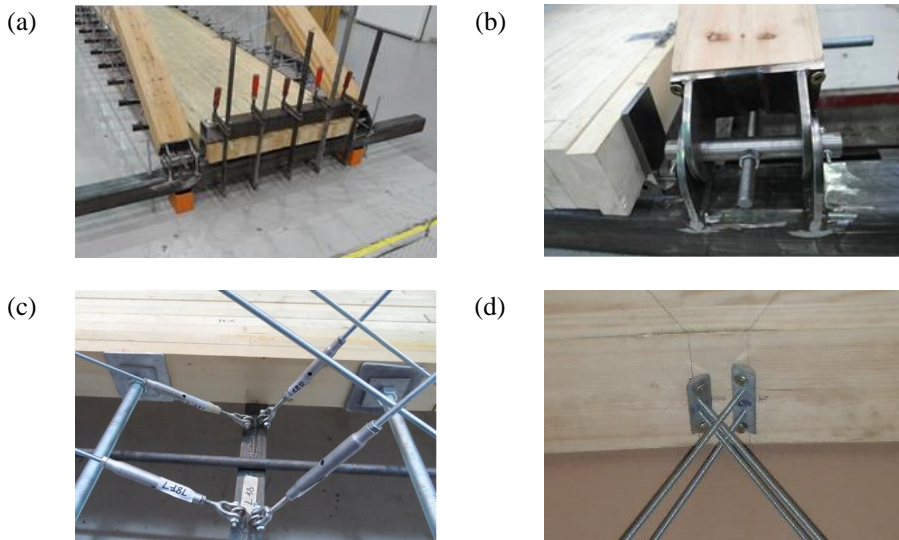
Details of the laboratory model of the bridge; a) arch and deck support; b) connection of the tie; c) hangers attachment to the crossbeams; d) hangers attachment to the arch.
